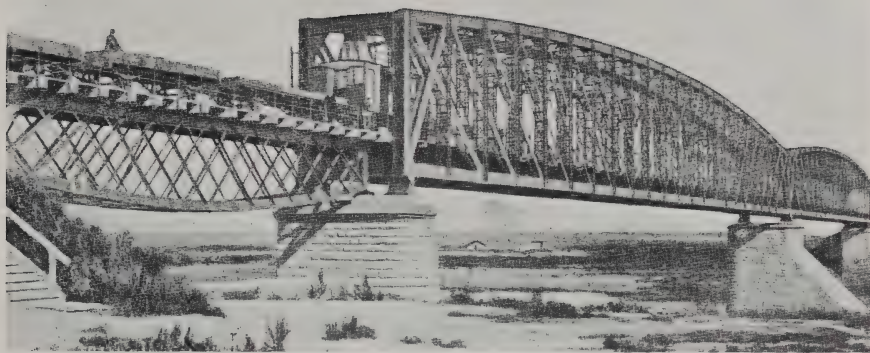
BRIDGE OVER THE ISHIM, TYPICAL OF THE BRIDGEWORK ON THE GREAT SIBERIAN RAILWAY.
